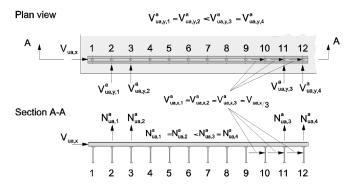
EXAMPLE FOR THE CALCULATION OF ANCHOR FORCES IN CASE OF ANCHOR CHANNELS WITH 12 ANCHORS LOADED IN SHEAR LONGITUDINAL TO THE CHANNEL AXIS FOR STEEL AND PRYOUT FAILURE
